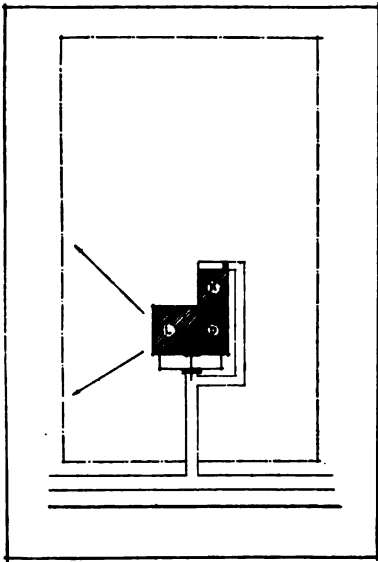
Diagram showing house placed in center of a lot's frontage. D, dining room; K, kitchen; L, living room
